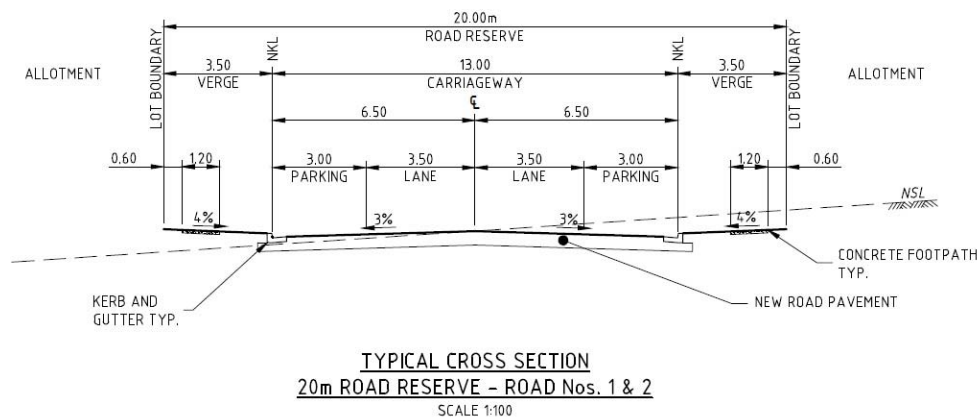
Approved typical cross section of new internal road running north-south through the site.
